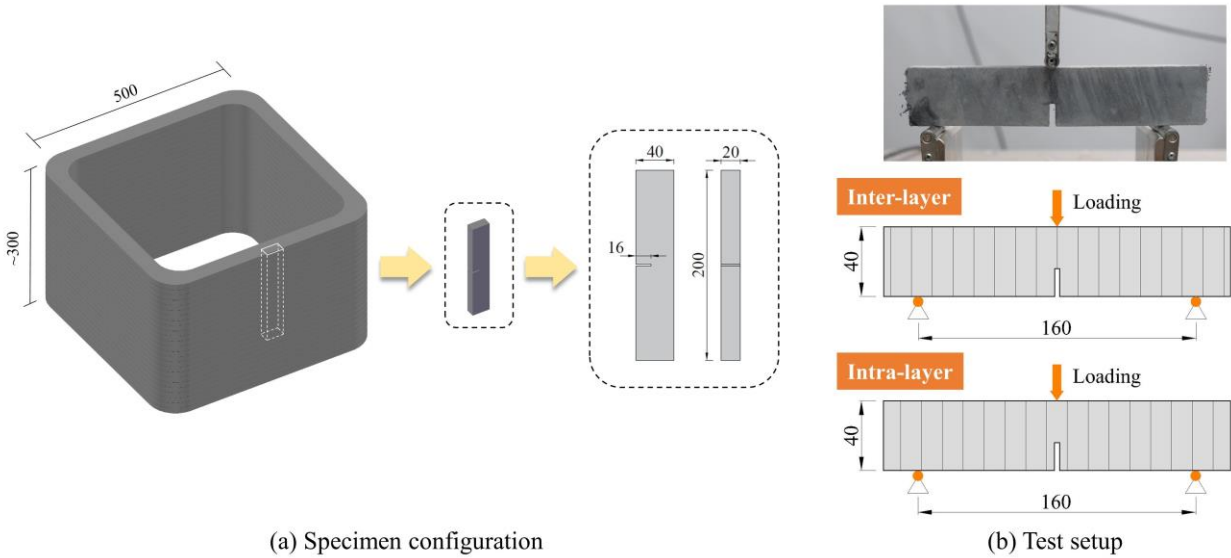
Interfacial fracture specimen and test setup (Unit: mm).
